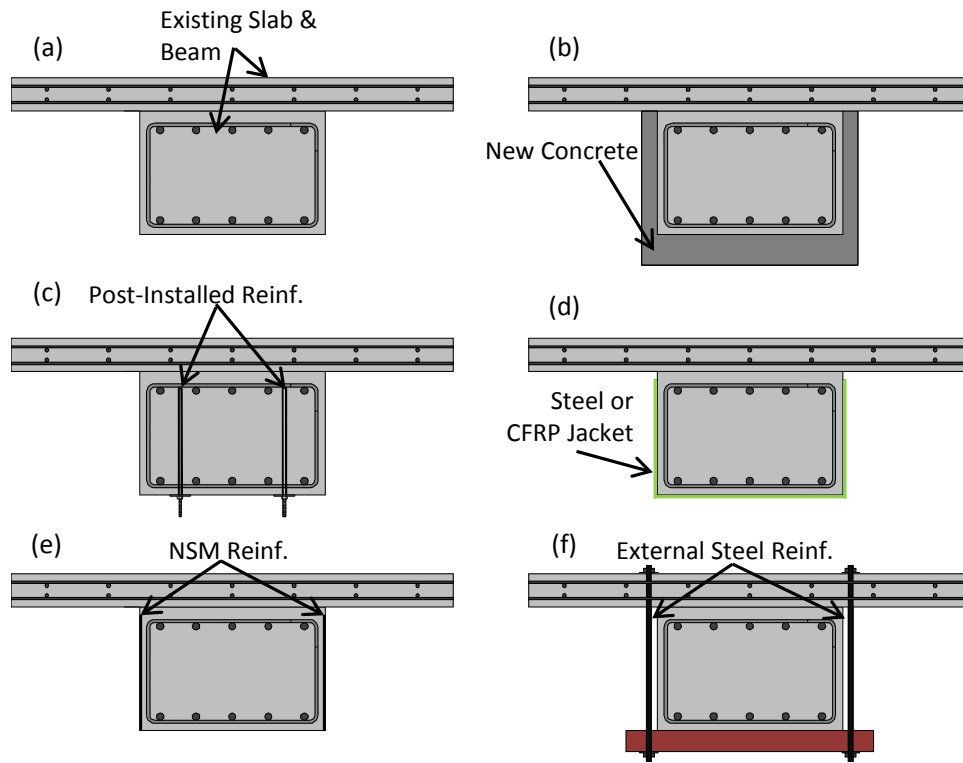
Strengthening existing RC elements in shear. a) unreinforced section; b) section enlargement by additional concrete and reinforcement; c) post-installed, bonded or un-bonded reinforcement-steel or FRP; d) external jacketing with CFRP or steel; e) near-surface mounted steel or CFRP rods or bars; (f) addition of external reinforcement.
